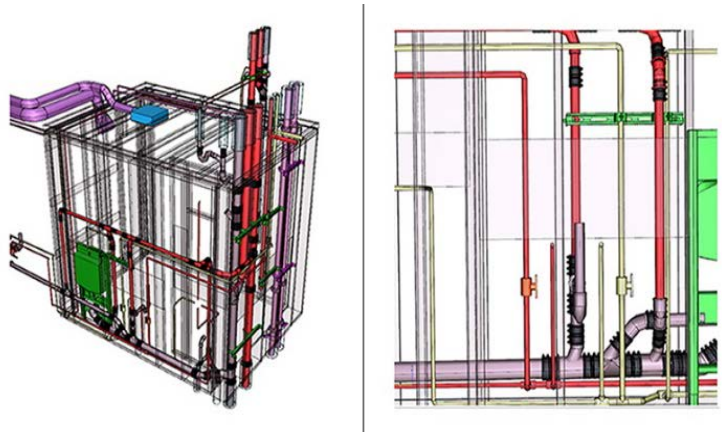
Detailed bathroom piping illustration
